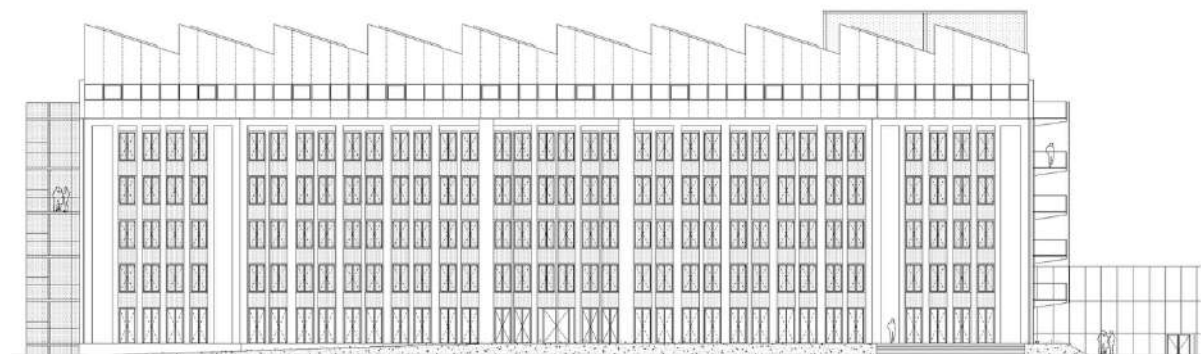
South-east view (courtyard side) of the existing building. Authors: PLURAL
